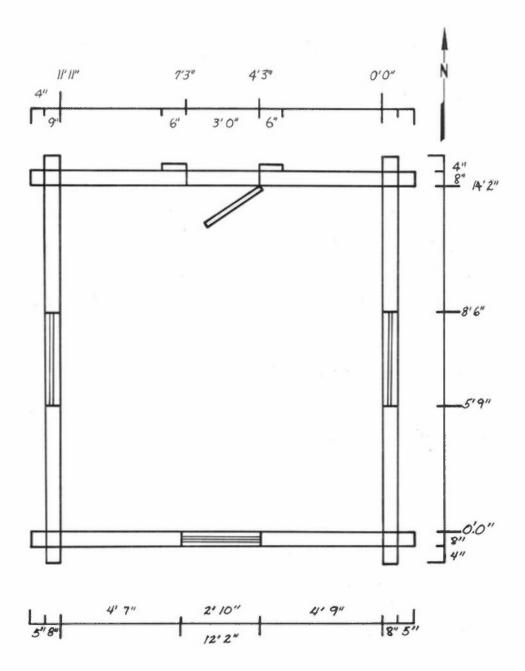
FLOOR PLAN - 20 MILE CABIN
